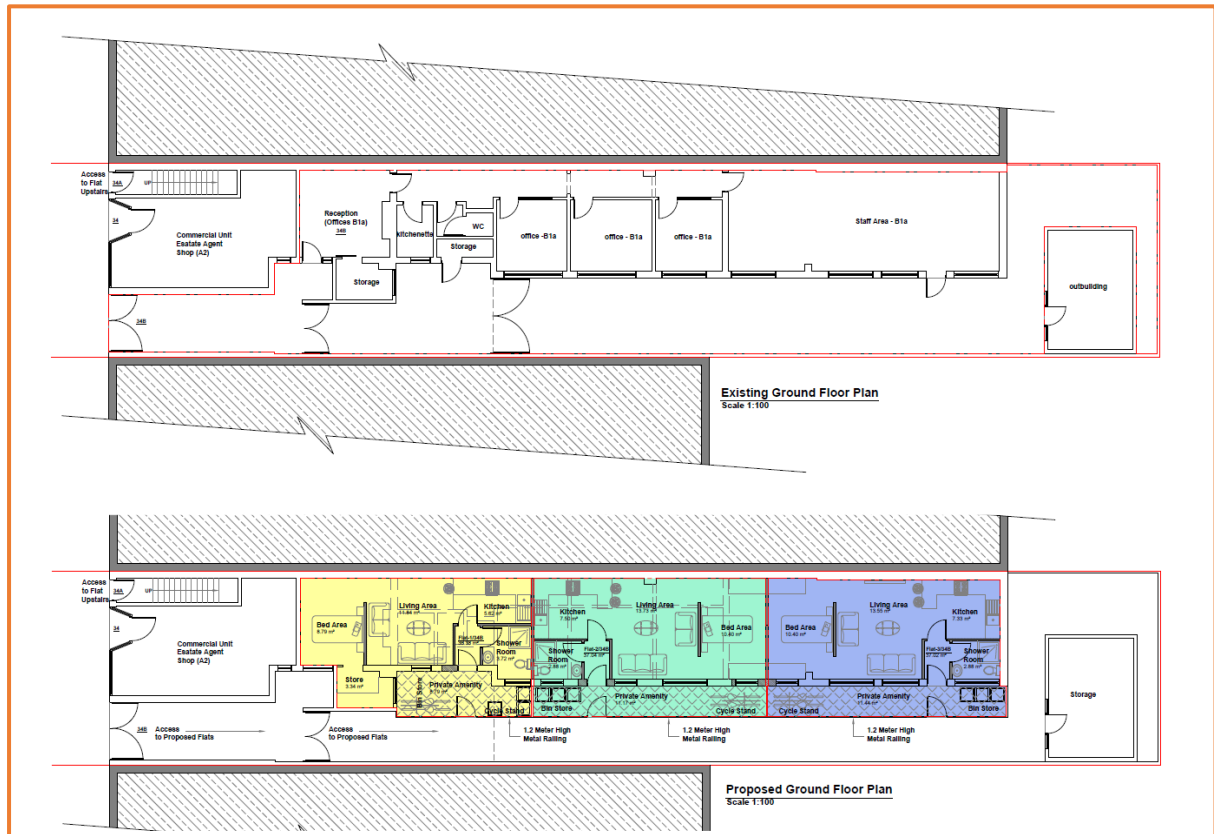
Existing and Proposed Ground Floor Plan (Source: Multi Creation)
